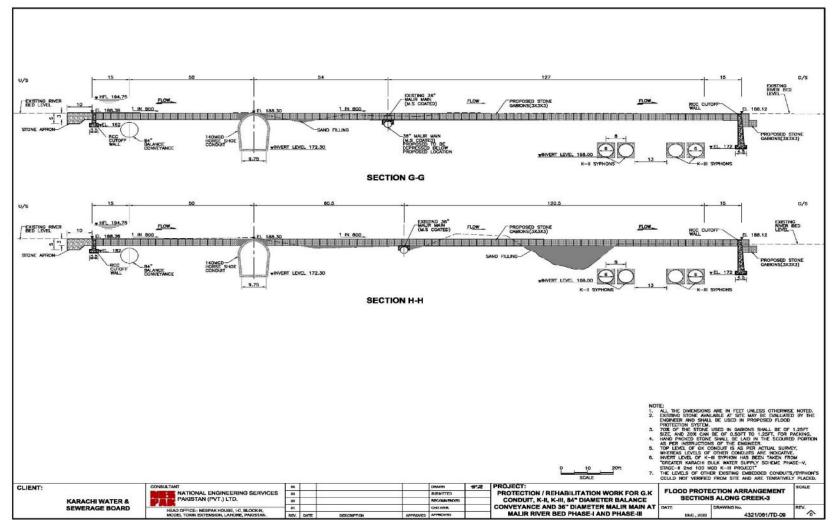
Flood Protection Arrangement along Creek-3 Section & Details
